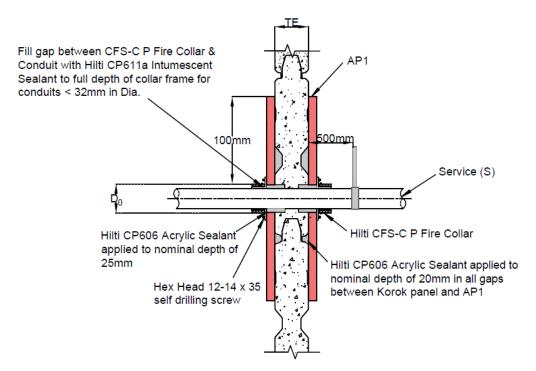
Rigid conduits < 50 mm in Dia. through 78 mm Korok panel system with AP1 additional protection
